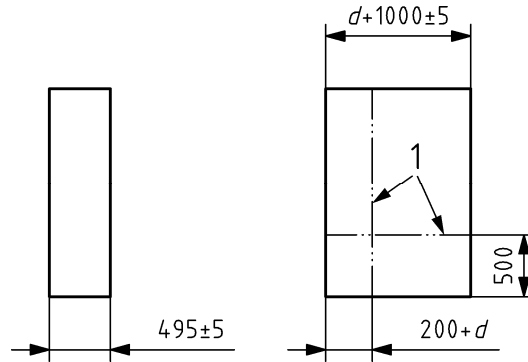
Joint arrangement for a product tested uncovered (front view)
